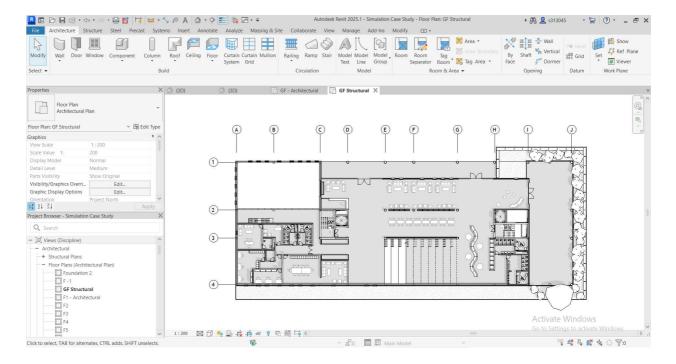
Ground floor plan in Revit after applying changes, Elaborated by Authors
